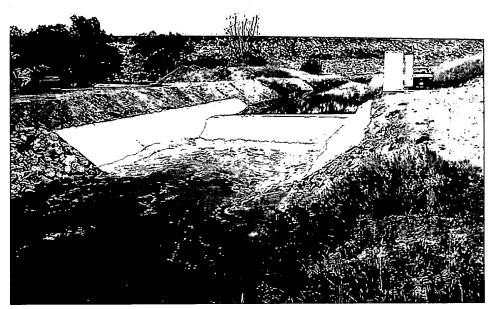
Flow over a flume near the head of Kirwin Canal, constructed as part of a short section of "lined" canal added to an earthen channel. Design capacity is 5.46 m³/s (193 ft³/s) (Kansas).
